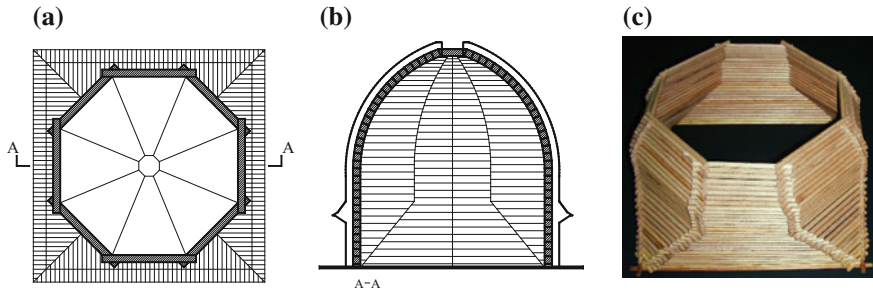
Sectional-cylindrical framework dome on the octagonal projection according to [4], a horizontal section with the projection of the vault, b vertical section, c model of a dome from beech wood
